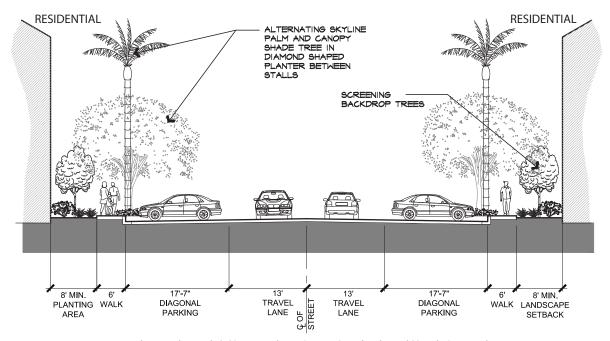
Via Asti - North Section (North Entrance) Private Streetscape Section and Plan
